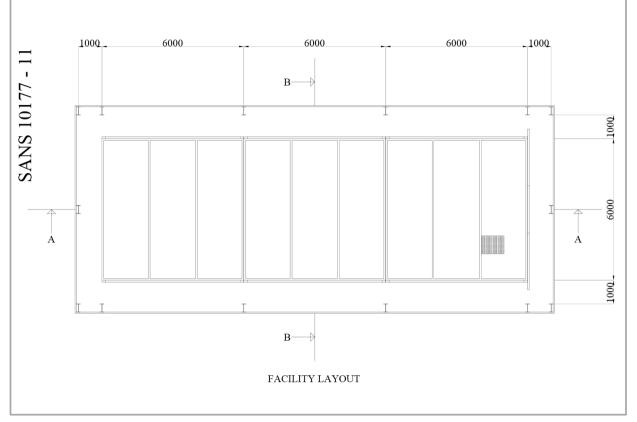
SANS 10177 - Part 11 test facility with specimen frames
